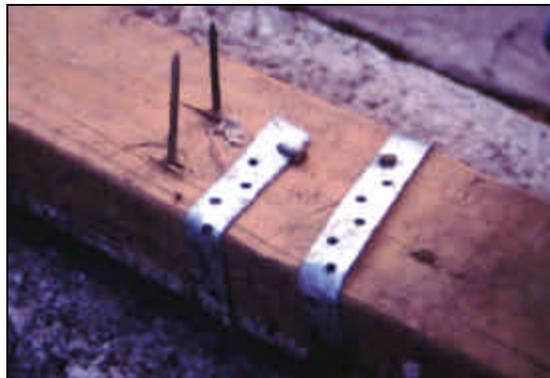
Metal straps held the bottom plate in place, however, failure occurred where the wall stud was straight-nailed through the bottom plate.
